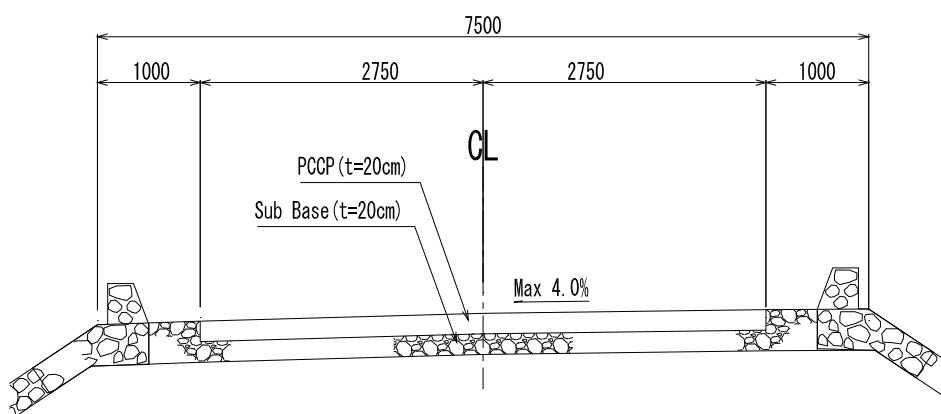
Typical Cross-section of Approach Road (Umiray bridge)
